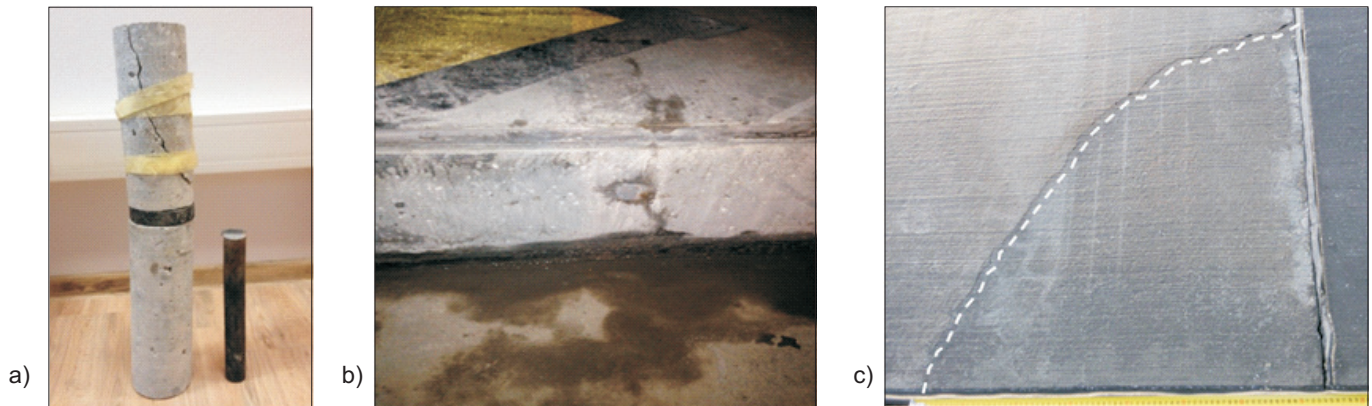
Survey of damaged airport pavement: a) view of core drilled from the pavement structure with a part of dowel installed in the surface layer placed next to it, b) crack in concrete slab within dowel width, c) cracking of slab corner (marked with a dashed line)
